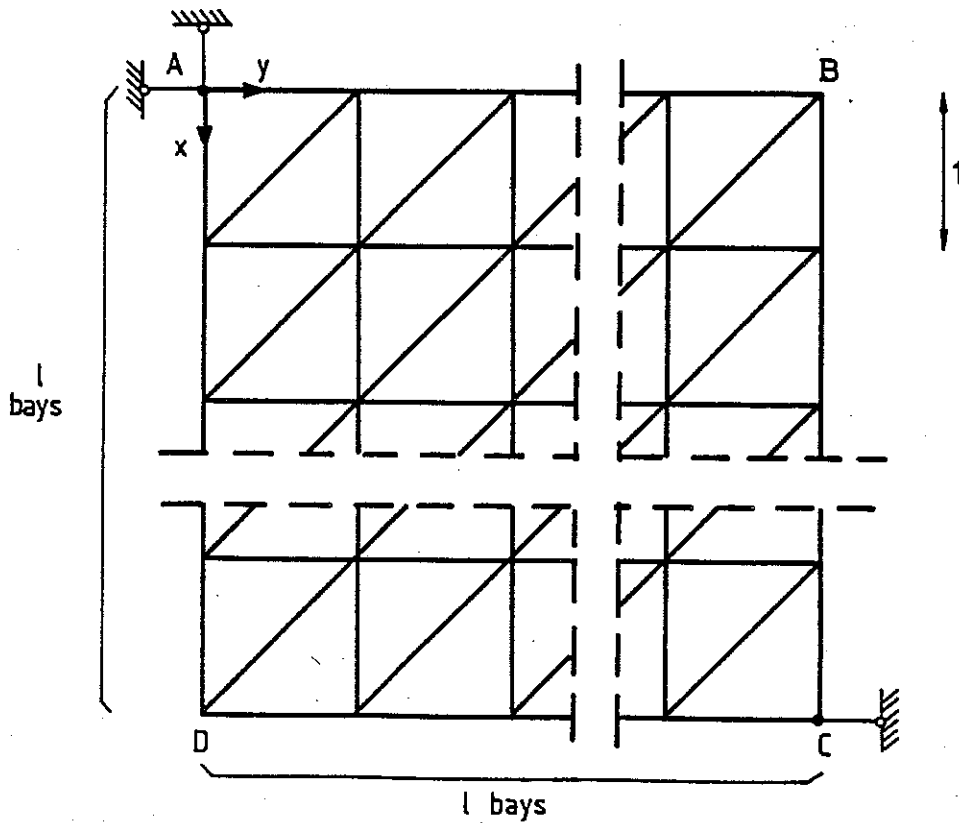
General layout of the triangulated hyperbolic paraboloid. Plan view.
